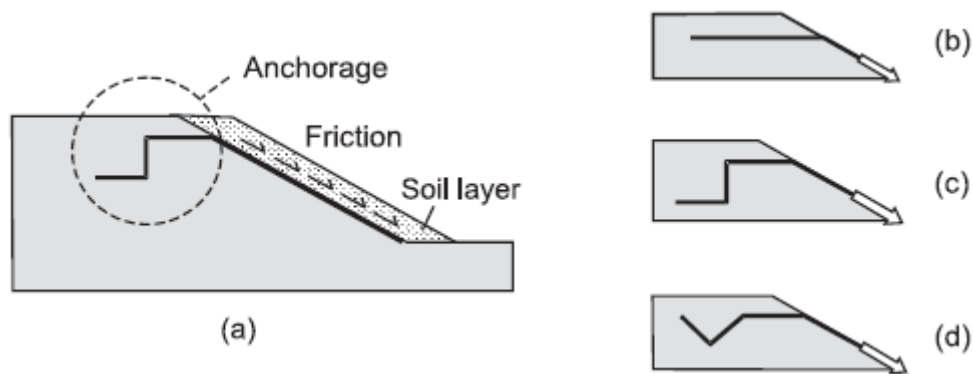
Types of anchors studied: (a) run-out anchorage; (b) vertical embedding; (c) L-shaped anchor (Chareyre et al. 2002)
